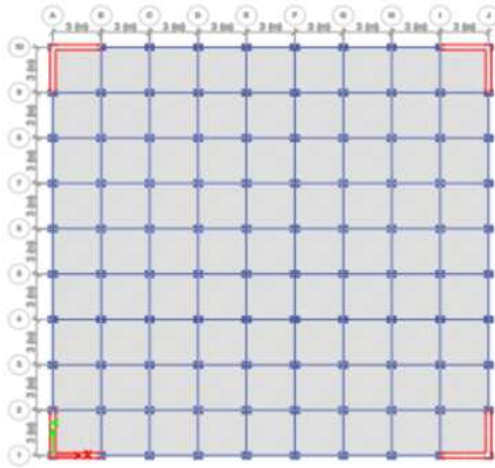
Building3DModel with C shaped Shearwall Fig:6 Building3DModel with C shaped Shearwall
